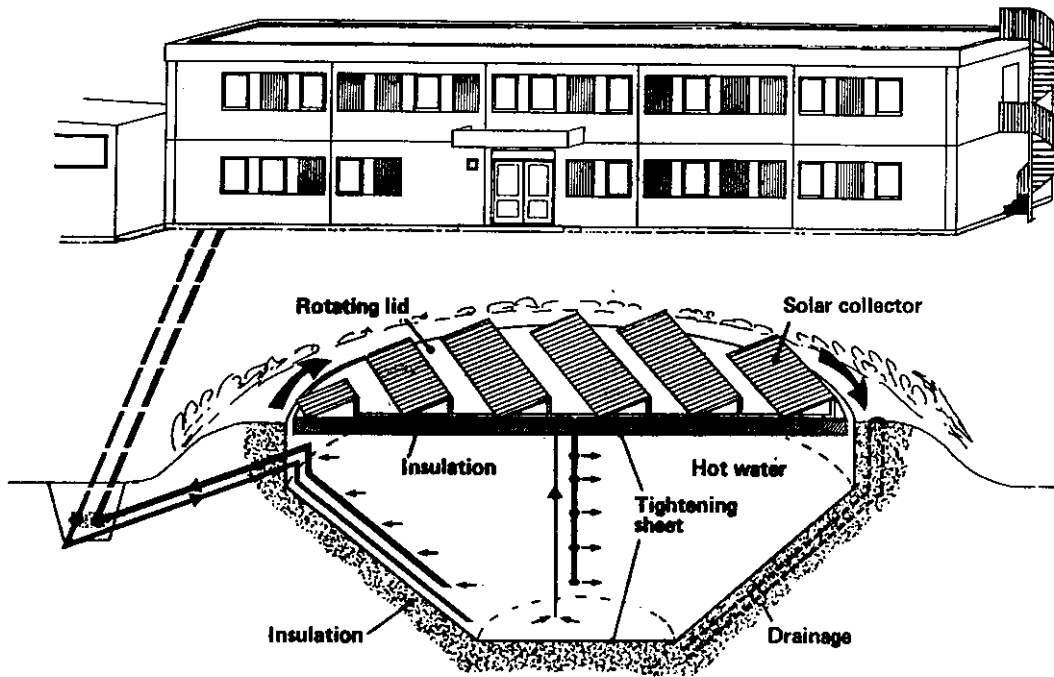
Studsvik pit/Sketch of the pilot plant and office building
